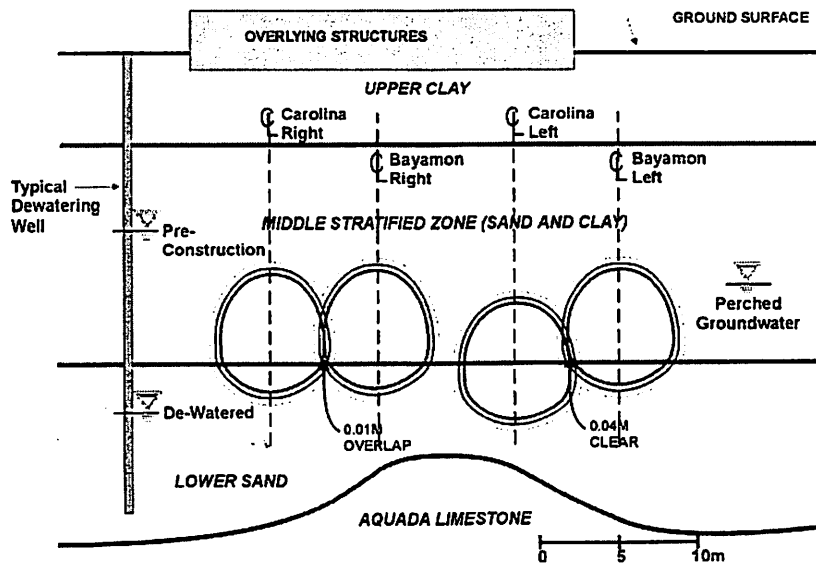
Typical Geotechnical Profile for Mined Tunnels
